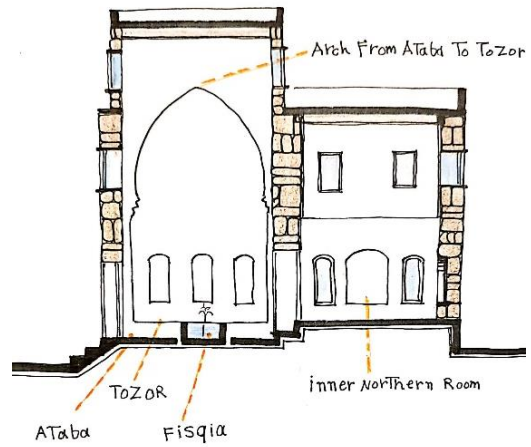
Section of Qa'a at Mardam Biek House sketched by Author.
